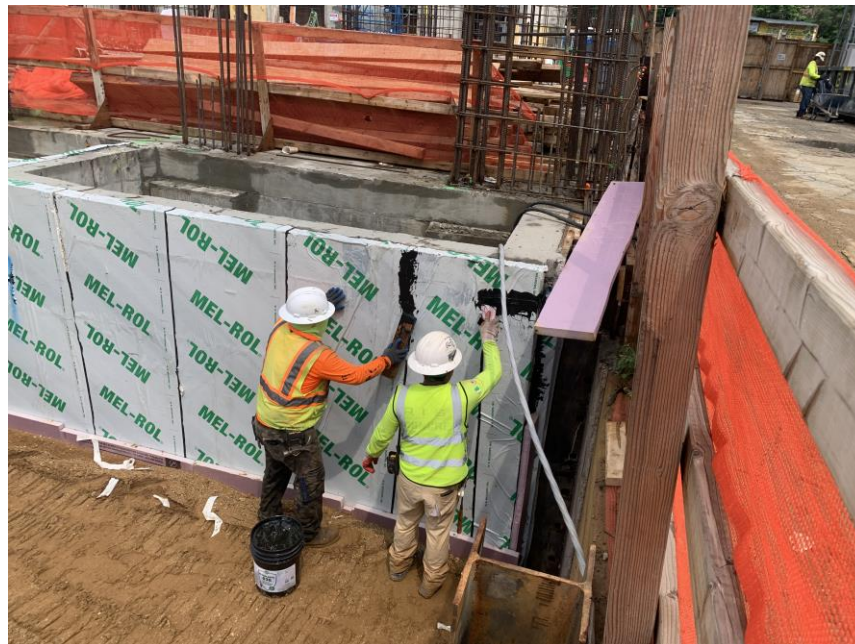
View of Legacy installing W.R. Meadows Mel-Rol ® waterproofing on a foundation wall in the eastern part of the site (facing east).
